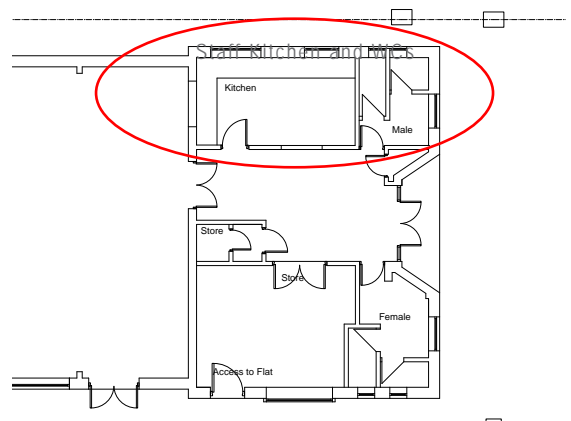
St. Mary Brookfield Hall Ground floor plan
